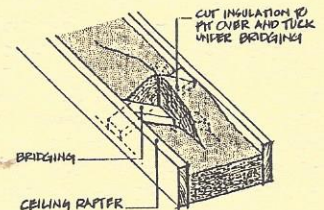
Installing Batt or Blanket Insulation Around Bracing
